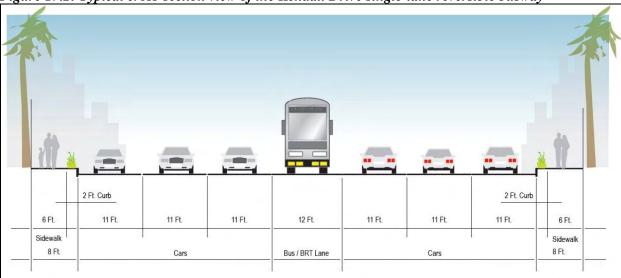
Typical cross-section view of the Kendall Drive single-lane reversible busway
